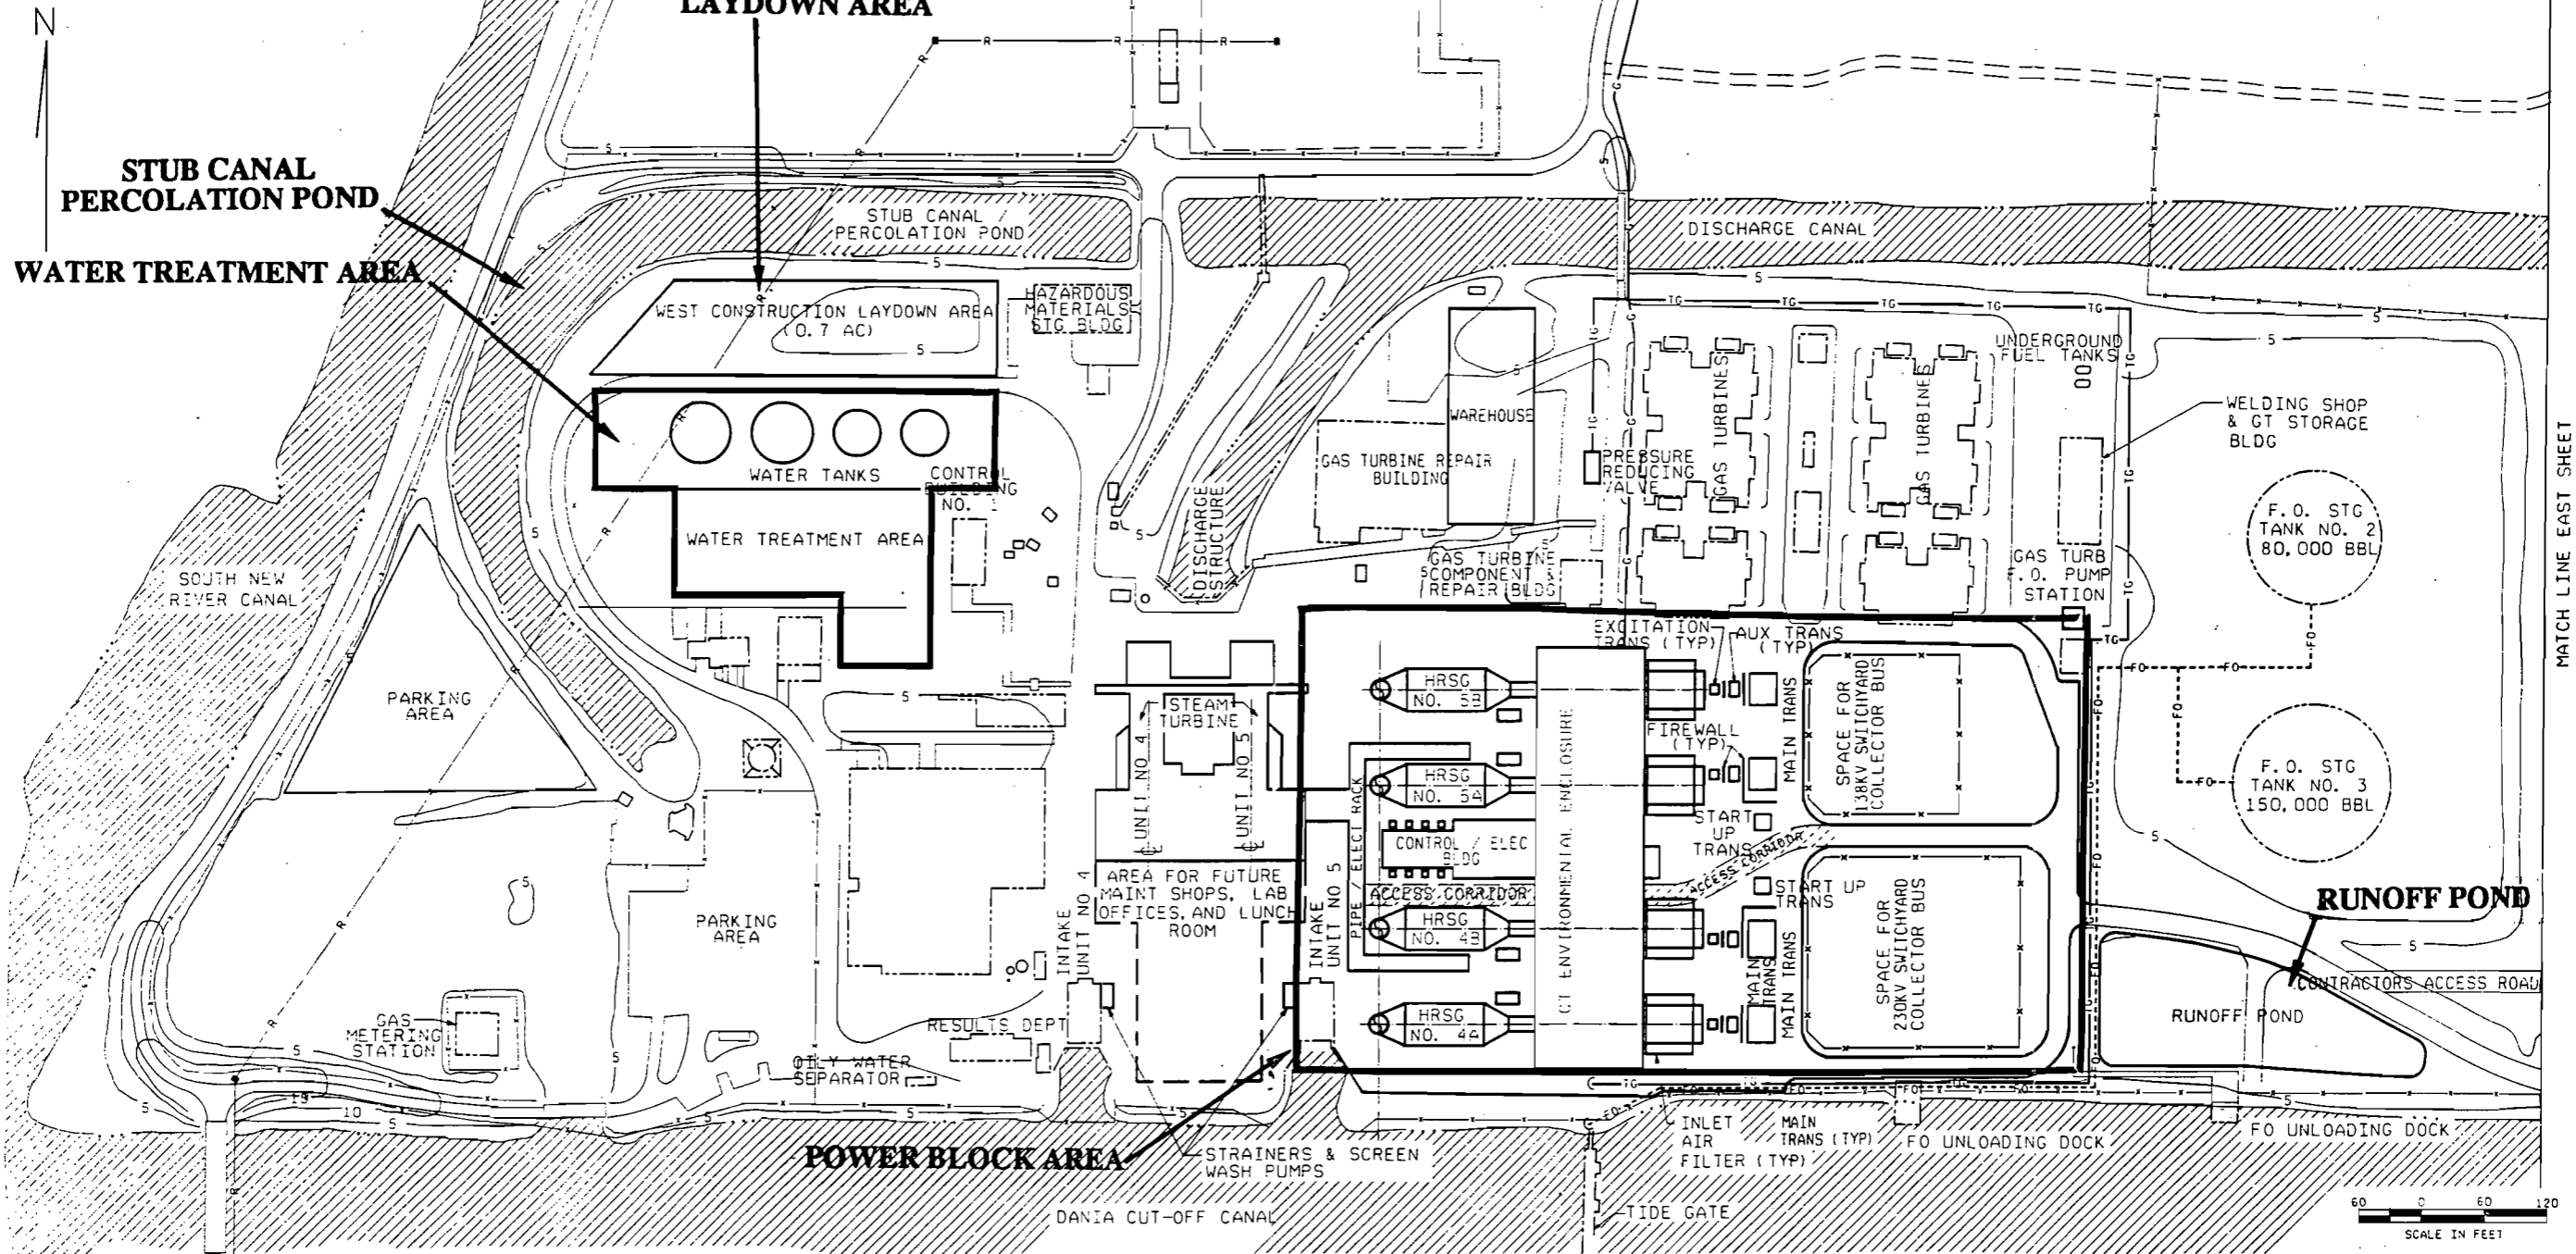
SITE DRAINAGE - WESTERN PORTION OF SITE
